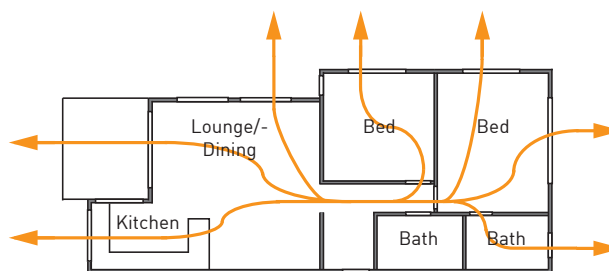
C.4-1: Building layout that facilitates cross ventilation.
